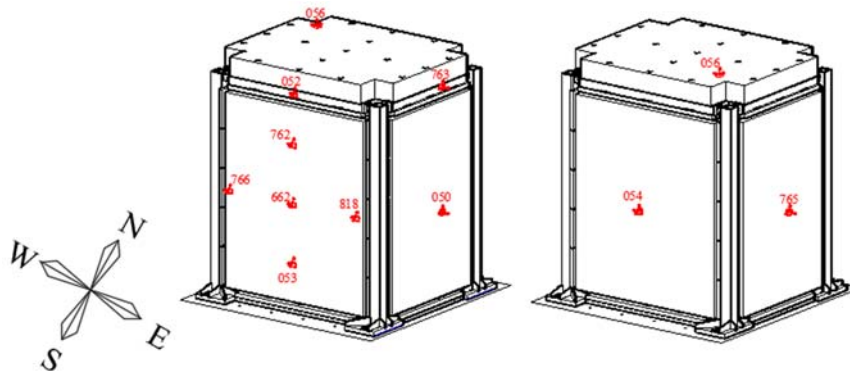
Accelerometer positions on both the steel test frame and the specimens.
